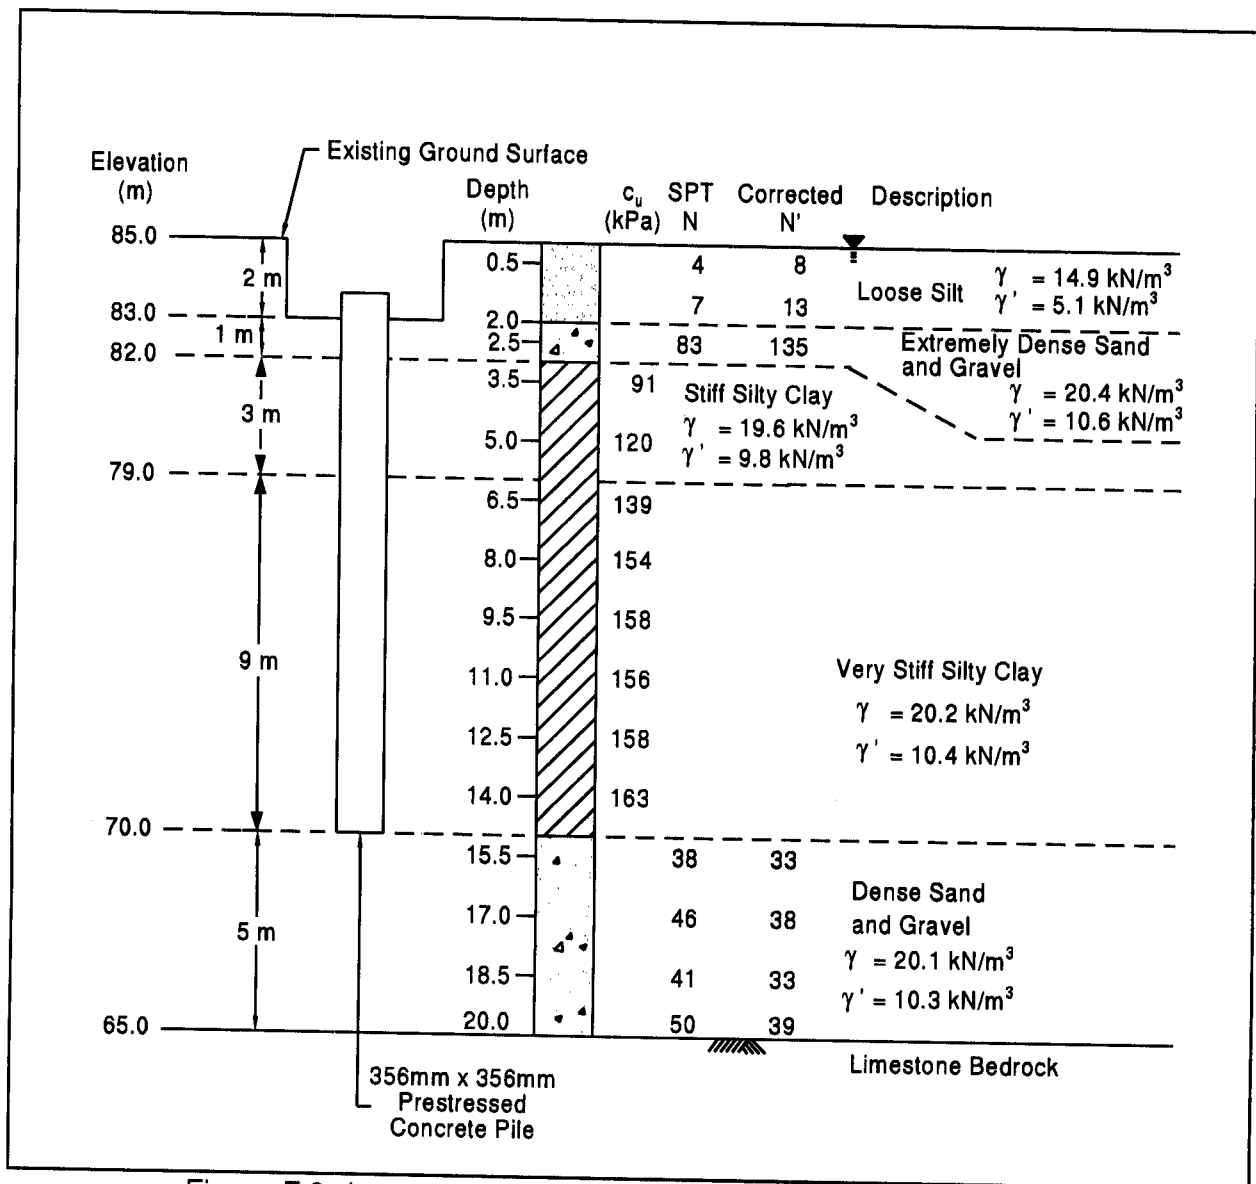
Interpreted Soil Profile from Soil Boring S-3 at Pier 3
